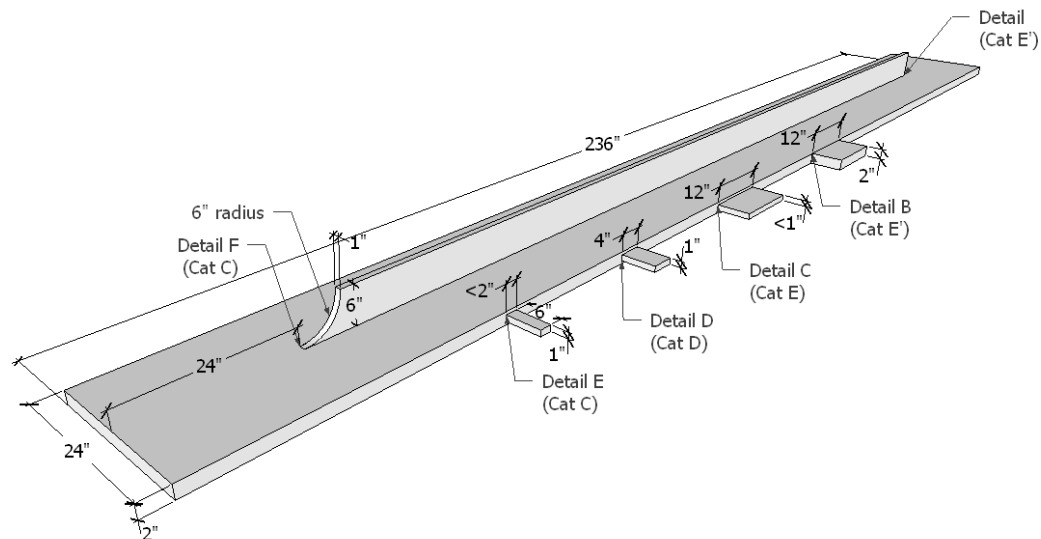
Cruciform specimen with attachments.
